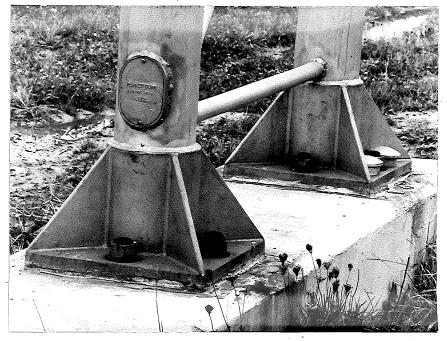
Extensive oxidation corrosion of steel nuts and bolt heads (and base plate staining) on an experimental overhead assembly on Farm Lane, MSU. Tubing, stiffener elements, and base plate are aluminum alloy, and bolts are cadmium-plated (0.2-mil) steel. Age: 5 years.
